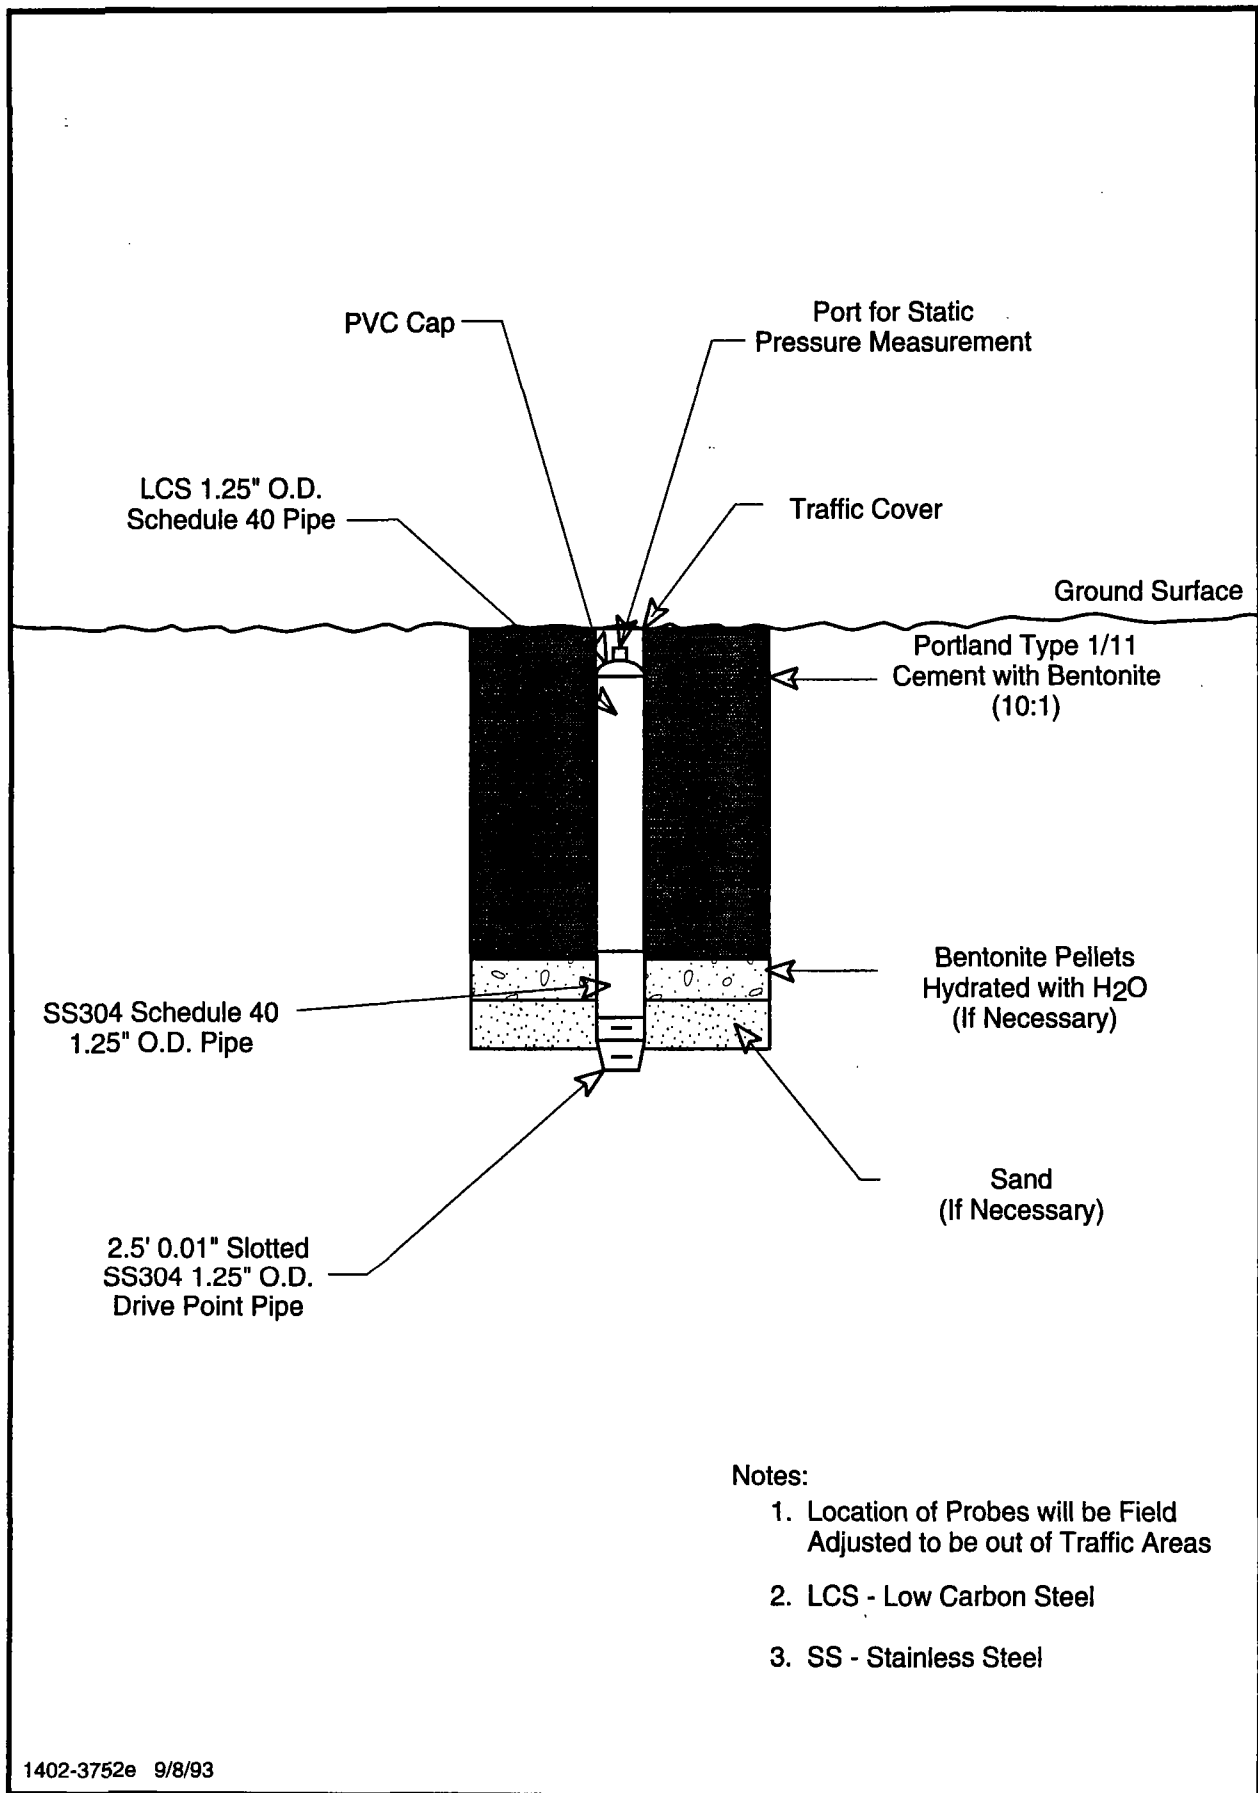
TYPICAL SVE VENT CONSTRUCTION
